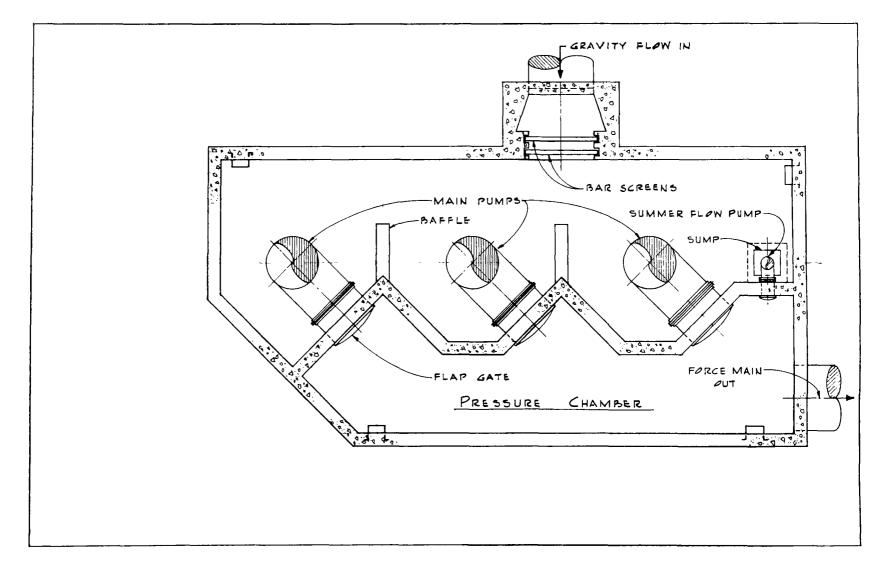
PLAN BELOW GRADE OF TYPICAL SUBSURFACE PUMP STATION
